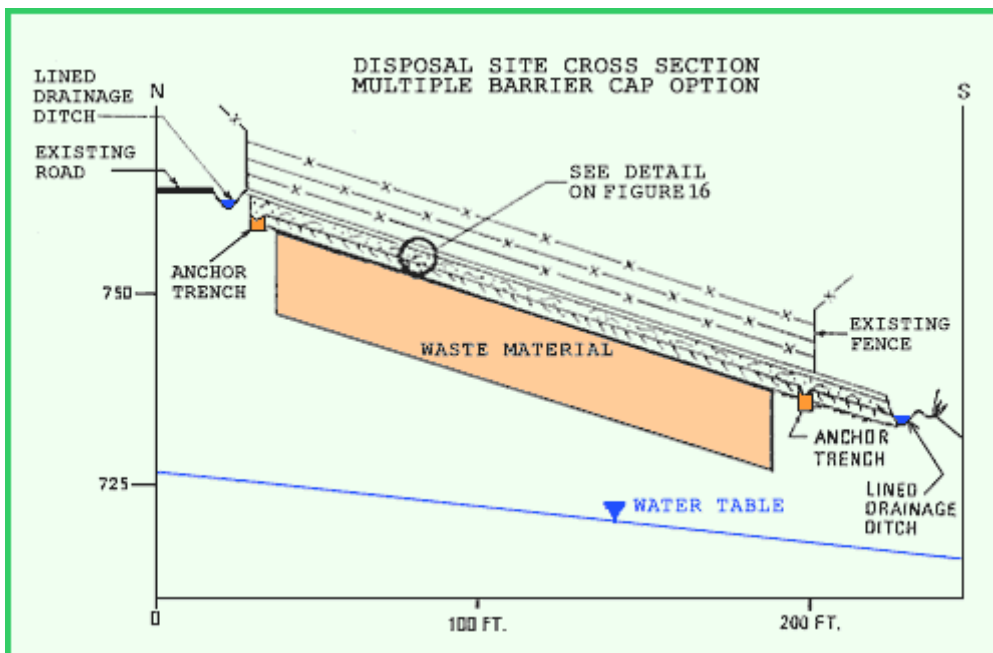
Cross Section of Multiple Barrier Cap installed over the Waste Disposal Trenches
